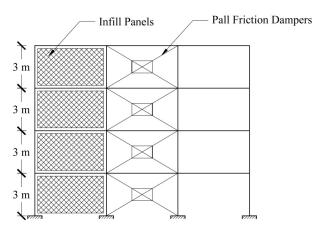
Configuration of the infill panel and friction damper in the steel frame
